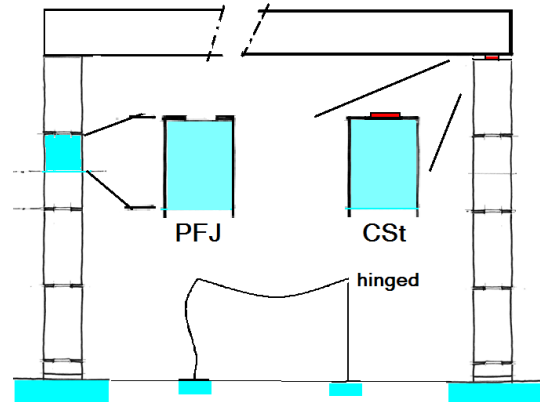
Wall, four layers of 600 mm high elements. Details of PFjoints and centre strip. Floor deformation, with and without centering strip, i.e. rigid or hinged connection.
